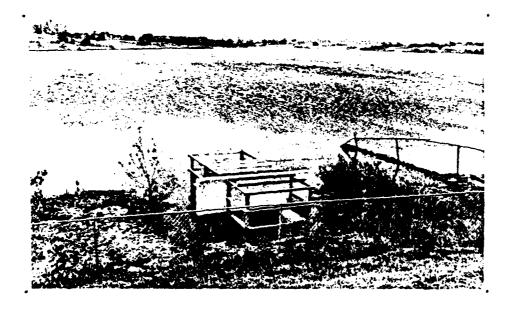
PRINCIPAL SPILLWAY FROM ABOUT STA. 7+60
